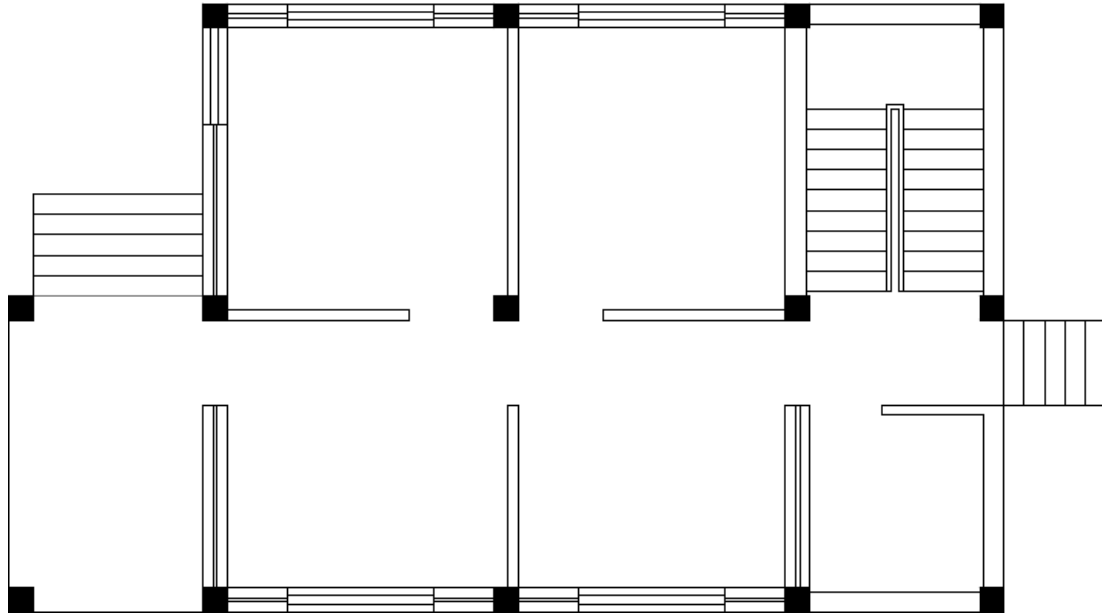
Ground Floor Plan - Typical 4-roomed model (Proposed)
